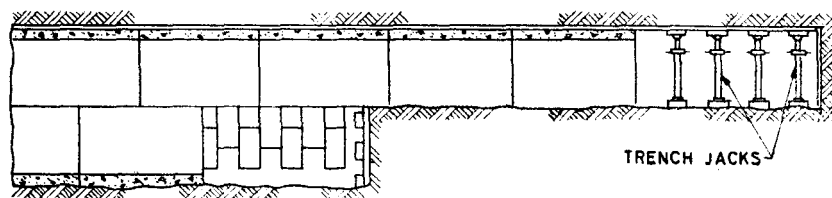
FLYING ARCH METHOD OF TUNNELING
